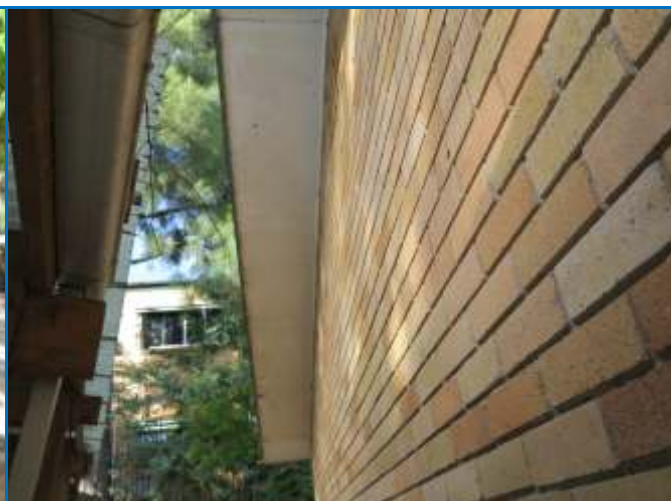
Block B Awning & Classroom Ceilings Lined With Fibre Cement. Deemed Asbestos Present.
